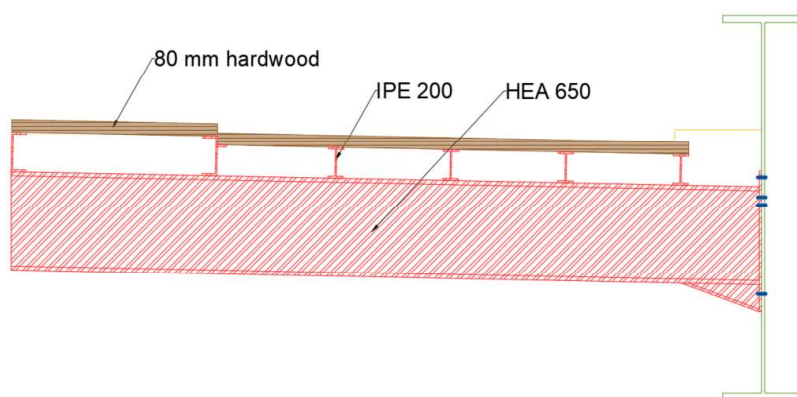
, Cross section FCP base variant, steel crossbeam with wooden deck.
